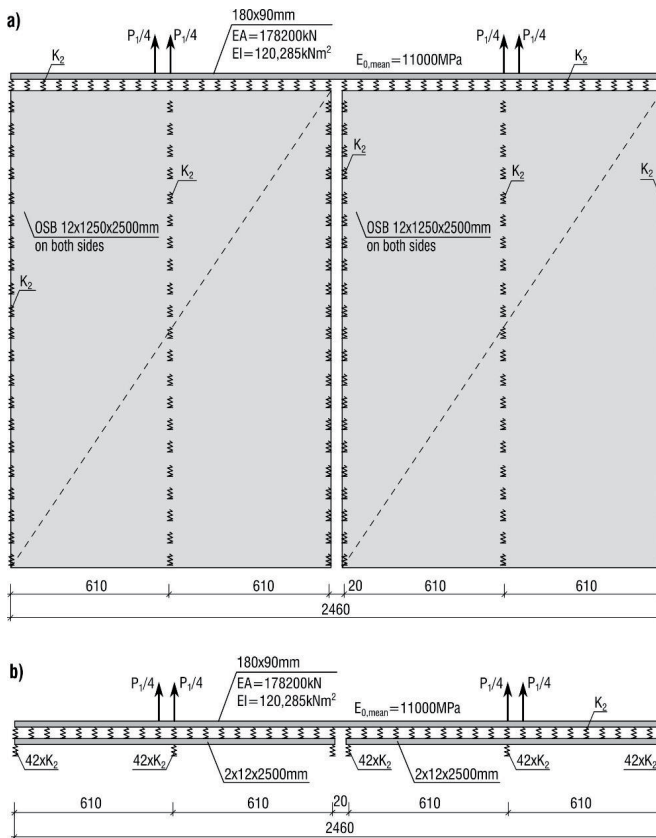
Conversion of full wall into system of contributed beams: a) connection of sheathing boards to timber framing and to the top plate in the form of spring fasteners, b) beams system linked with spring elements projecting the full wall – ACBS model.
